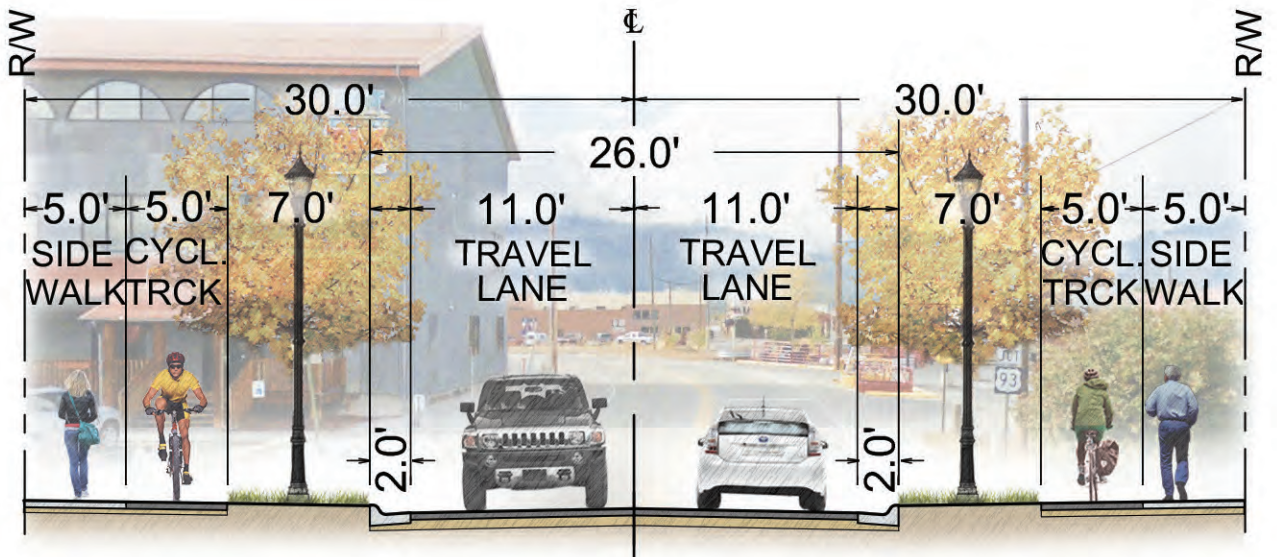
Typical Section C Highway 93 to Big Corral Road/Freeze Lane
